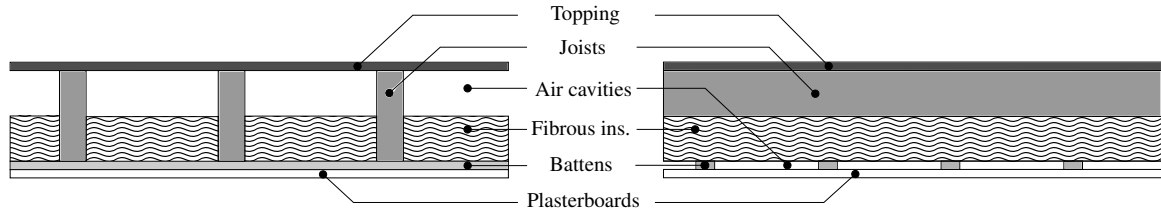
Schematic layout (left and right views) for the considered admissible class of floors.
